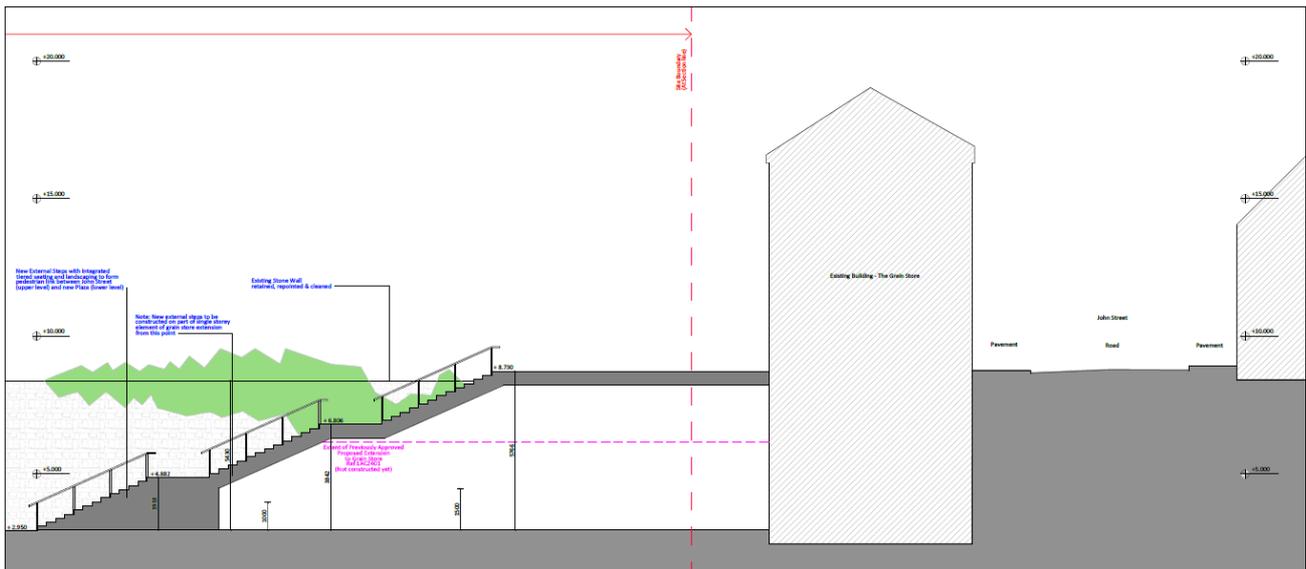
Cross section of site from John St. down to River Barrow (Source: ODKM Architects)
